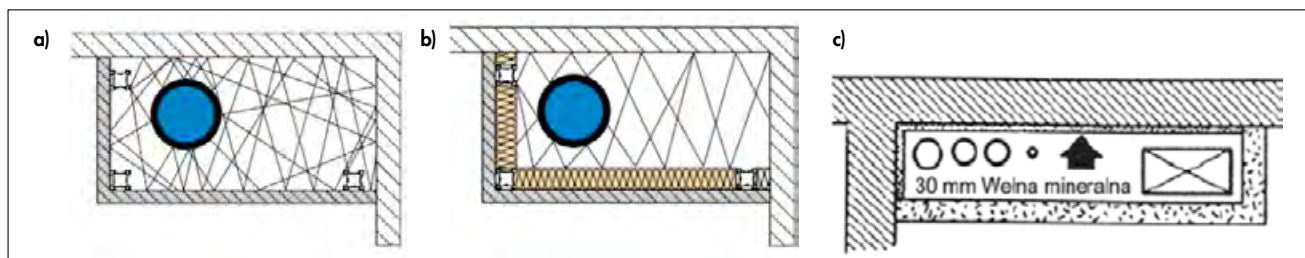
The basic principle of silent installation is to isolate sewage connections from the building structure. Example of installation in a solid (a) and light (b) installation wall [1].
